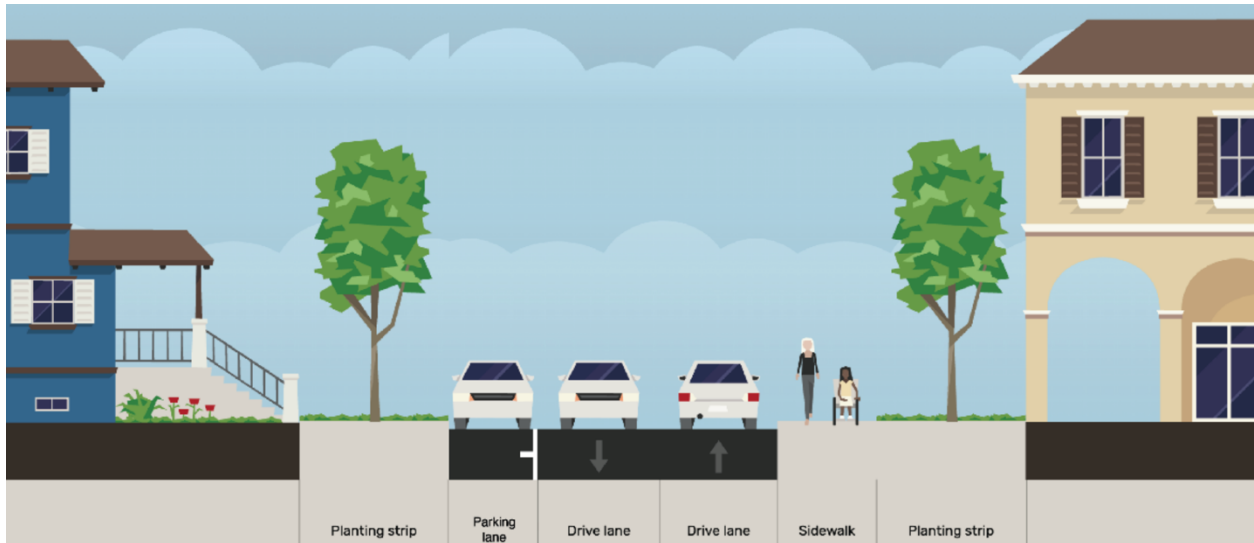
Recommended 20m wide local road cross-section, prepared by TYLin, conceptual and NTS
